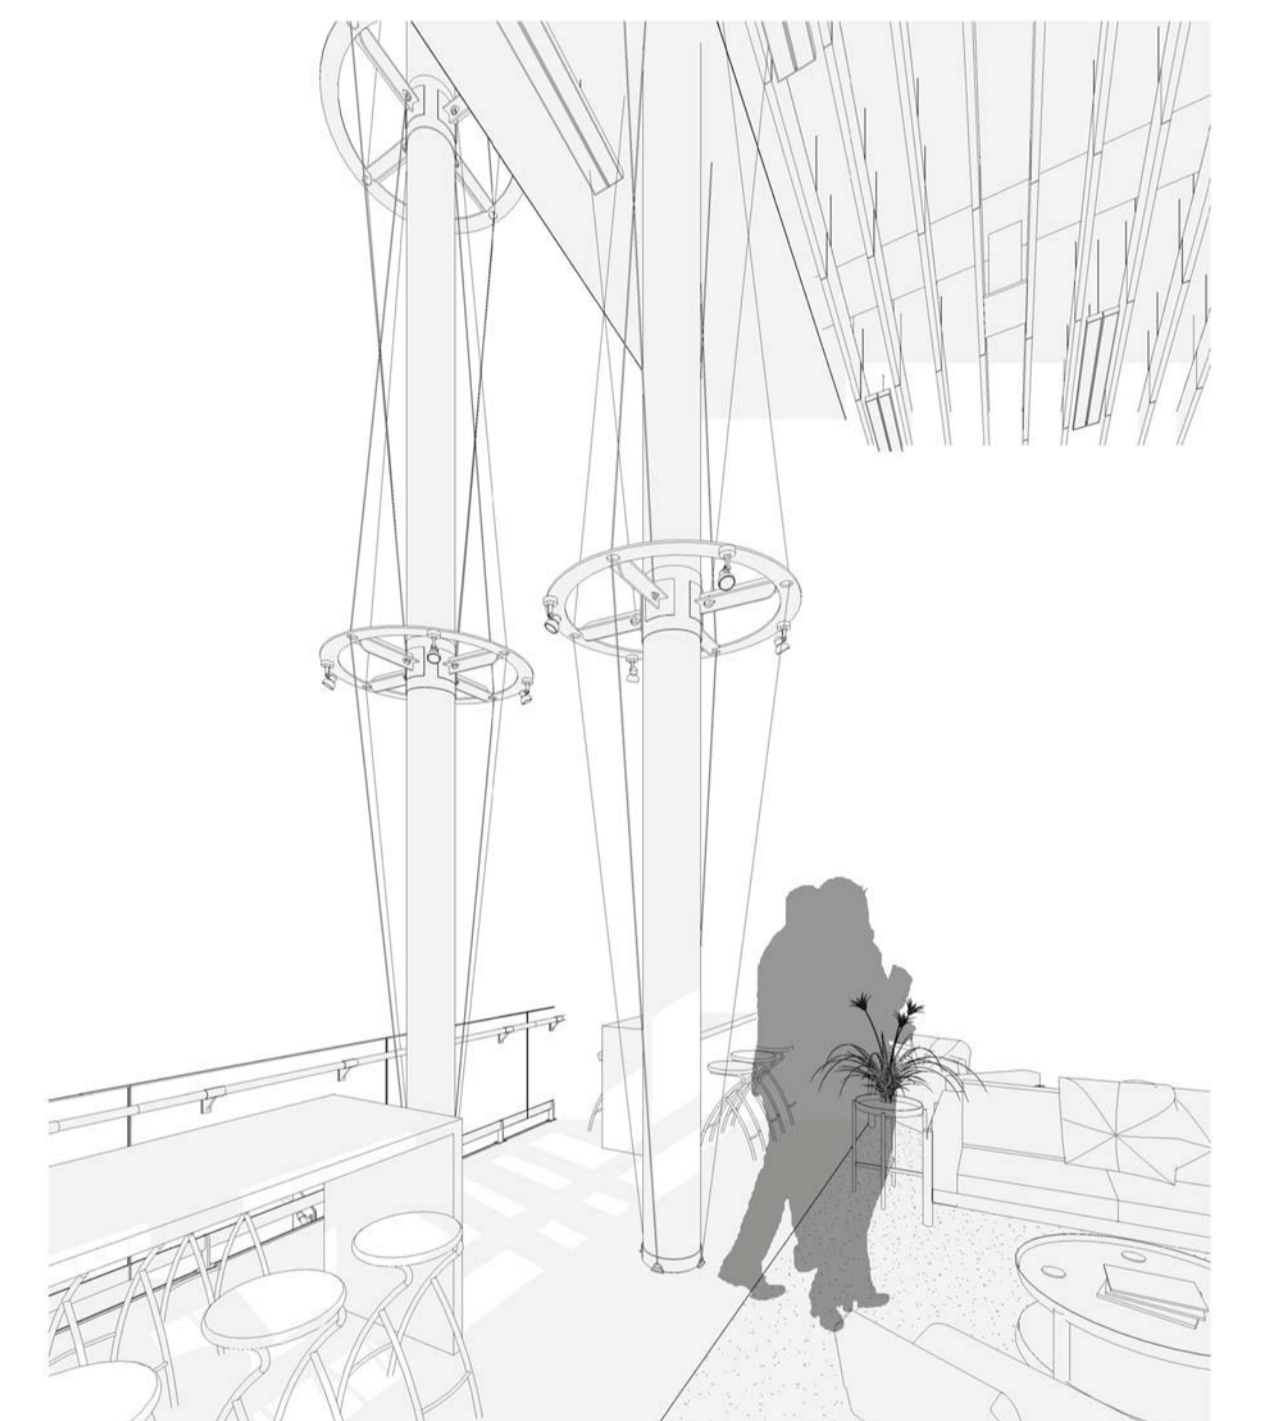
Perspective of The Parlour showing the support added to the existing column.
